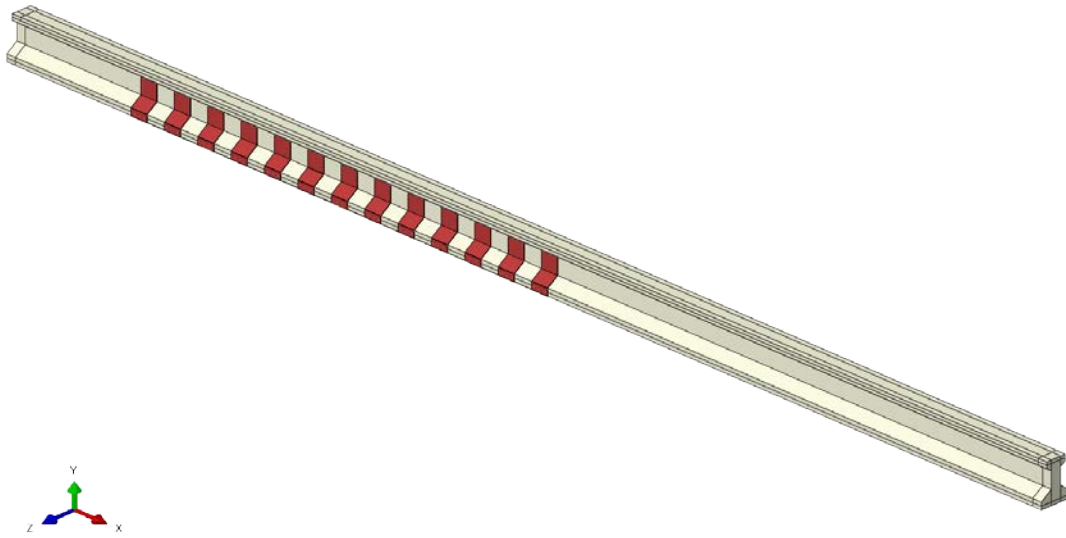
Repaired girder with CFRP laminate and U wraps
